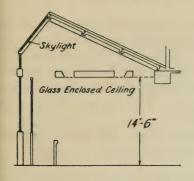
Plan and Elevation. 7.—Plan and Elevation.
